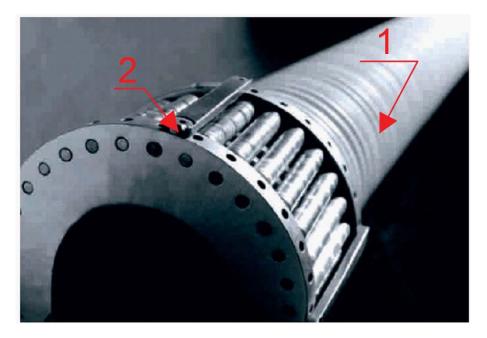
Self-supporting casing sheet using *SPR EX / SWP DF* technology: 1 — pipe body; 2 — winding machine
